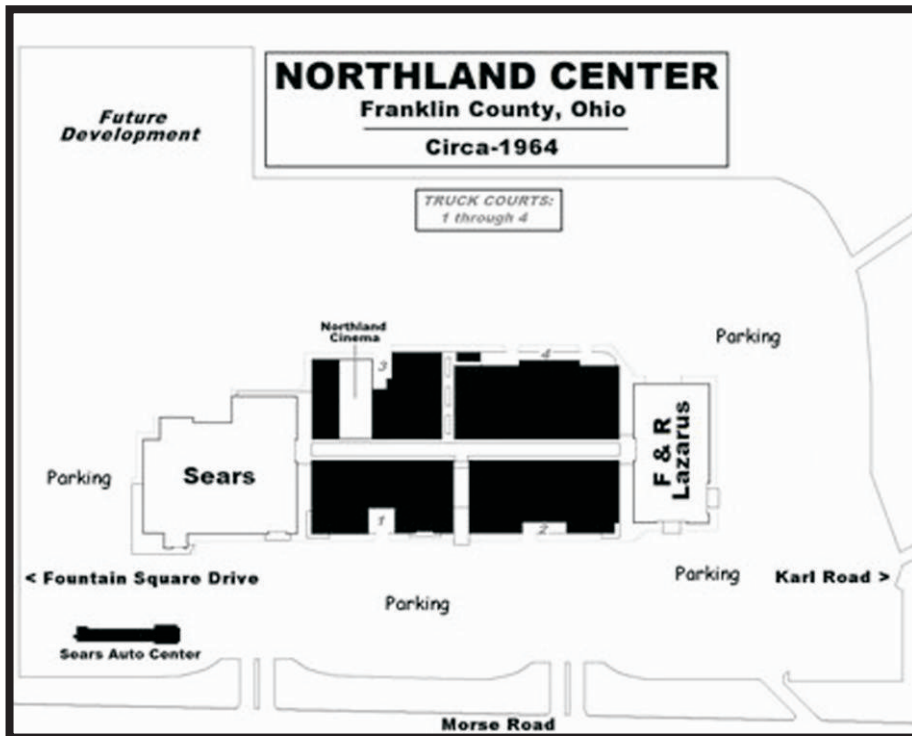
Ca. 1964 site plan for Northland Shopping Mall near Columbus (Mall Hall of Fame 2008a).
